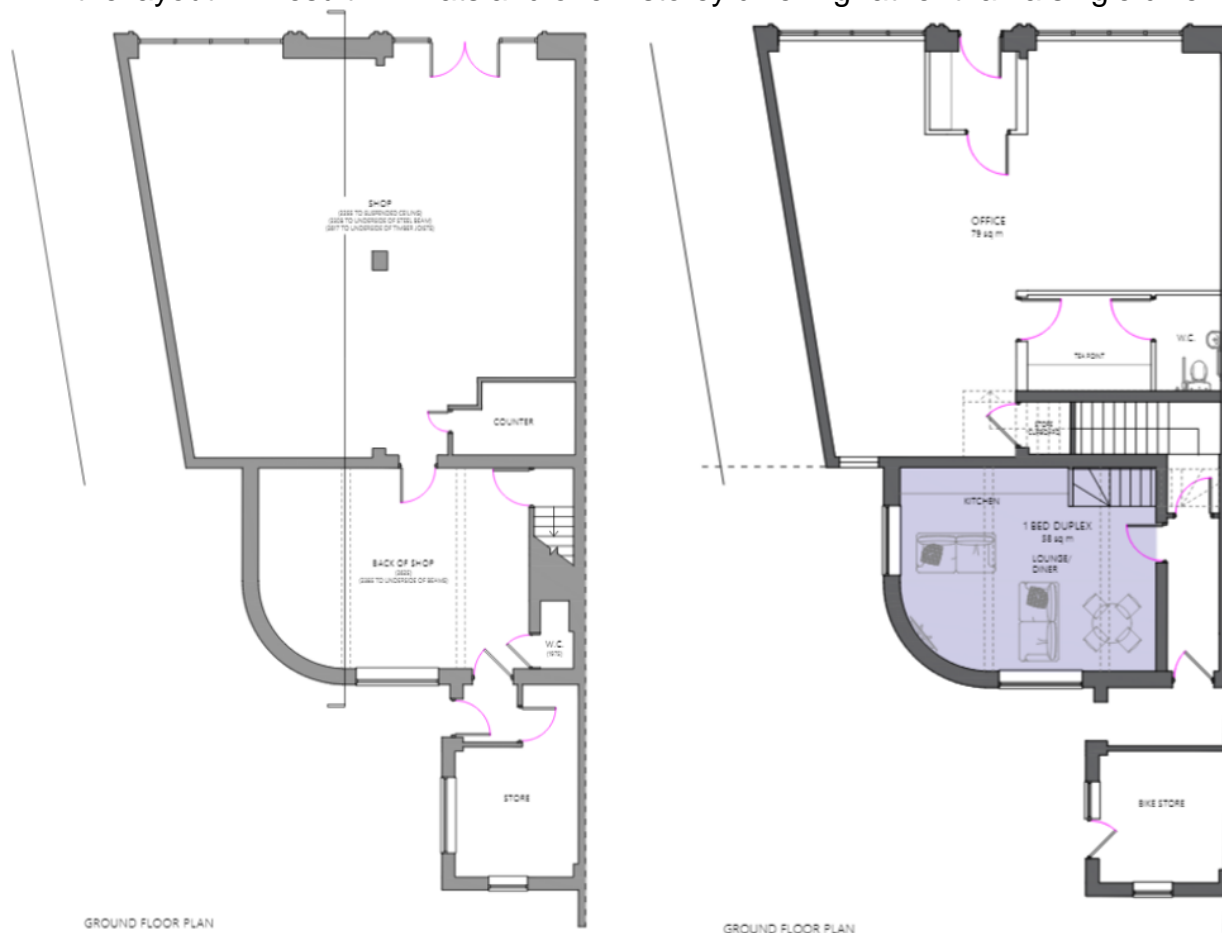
existing (left) and proposed (right) ground floor plans showing the area of commercial use to be lost(purple)
